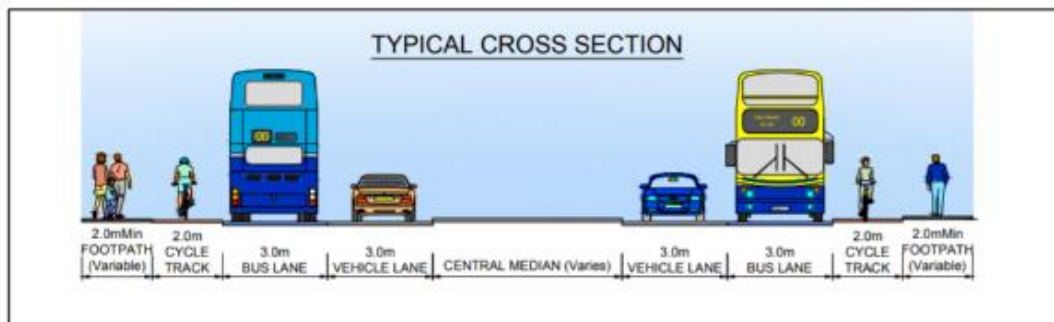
Proposed Road Cross-Section in Section 4 in the Emerging Preferred Route Option
